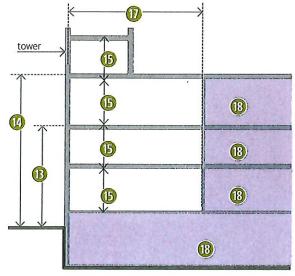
C. Flat Building: Height and Use Requirements.
